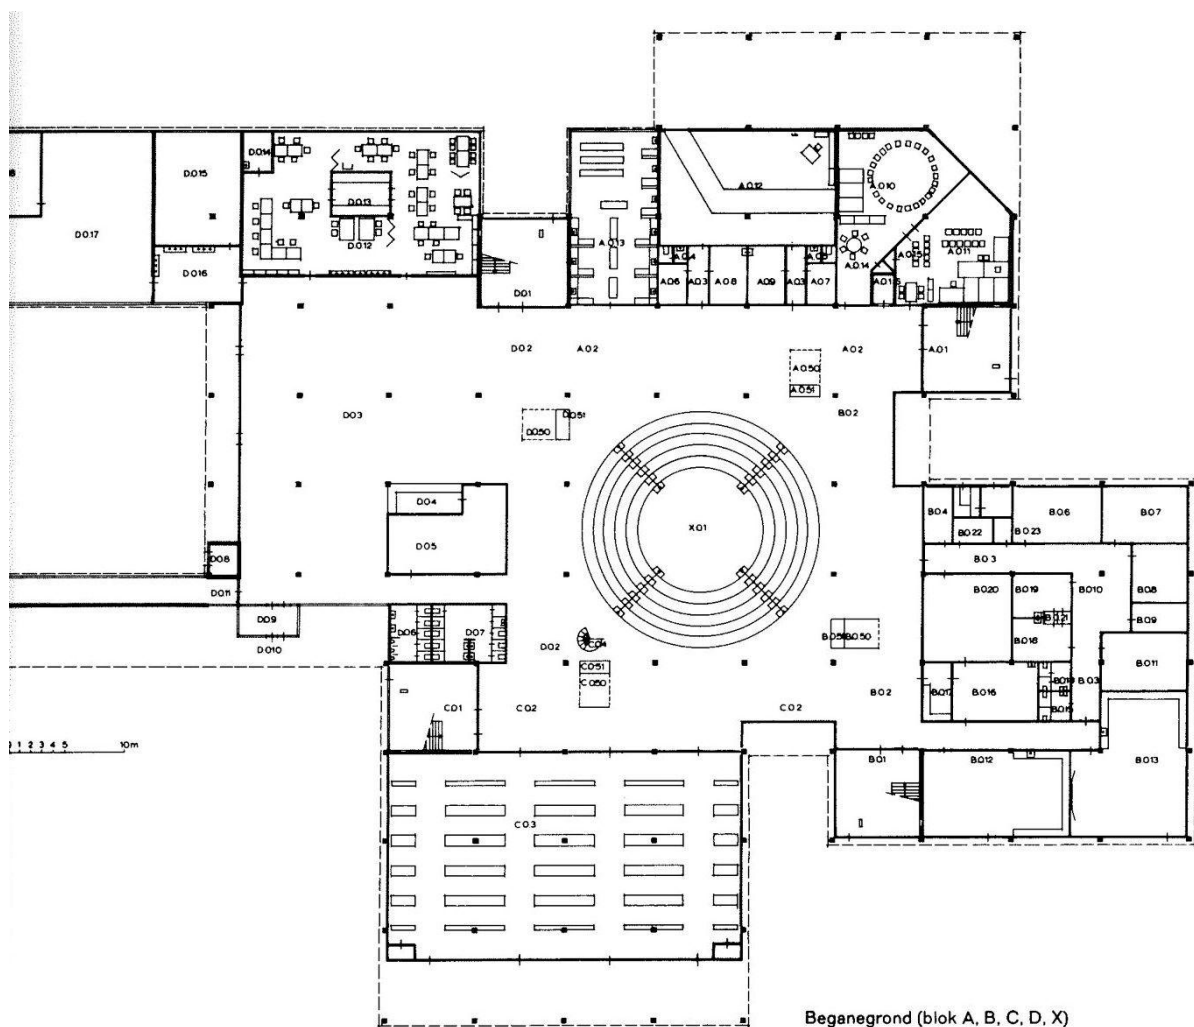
Floor plan of the ground floor, secondary education, 1973. (source: (Van den Bosch et al., 1980, p. 121).
